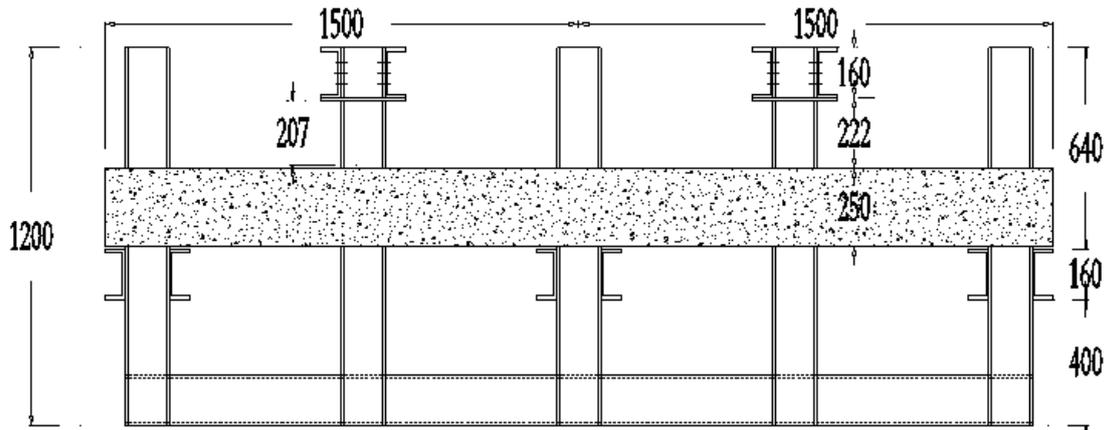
Schematic drawing for a beam loaded in the loading frame, dimensions in mm
